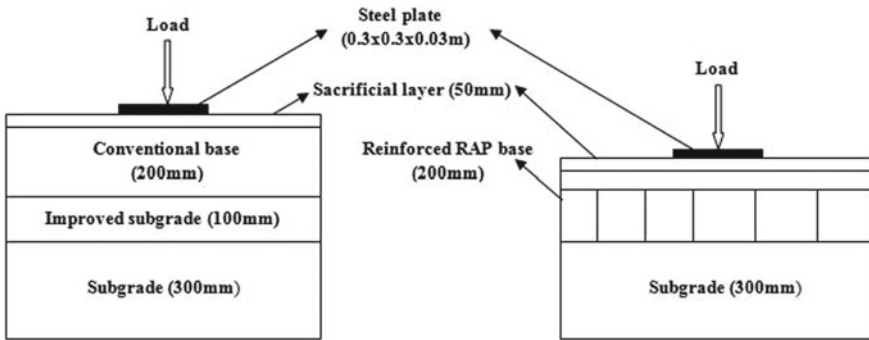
Cross section of unreinforced and geocell reinforced model pavement sections
